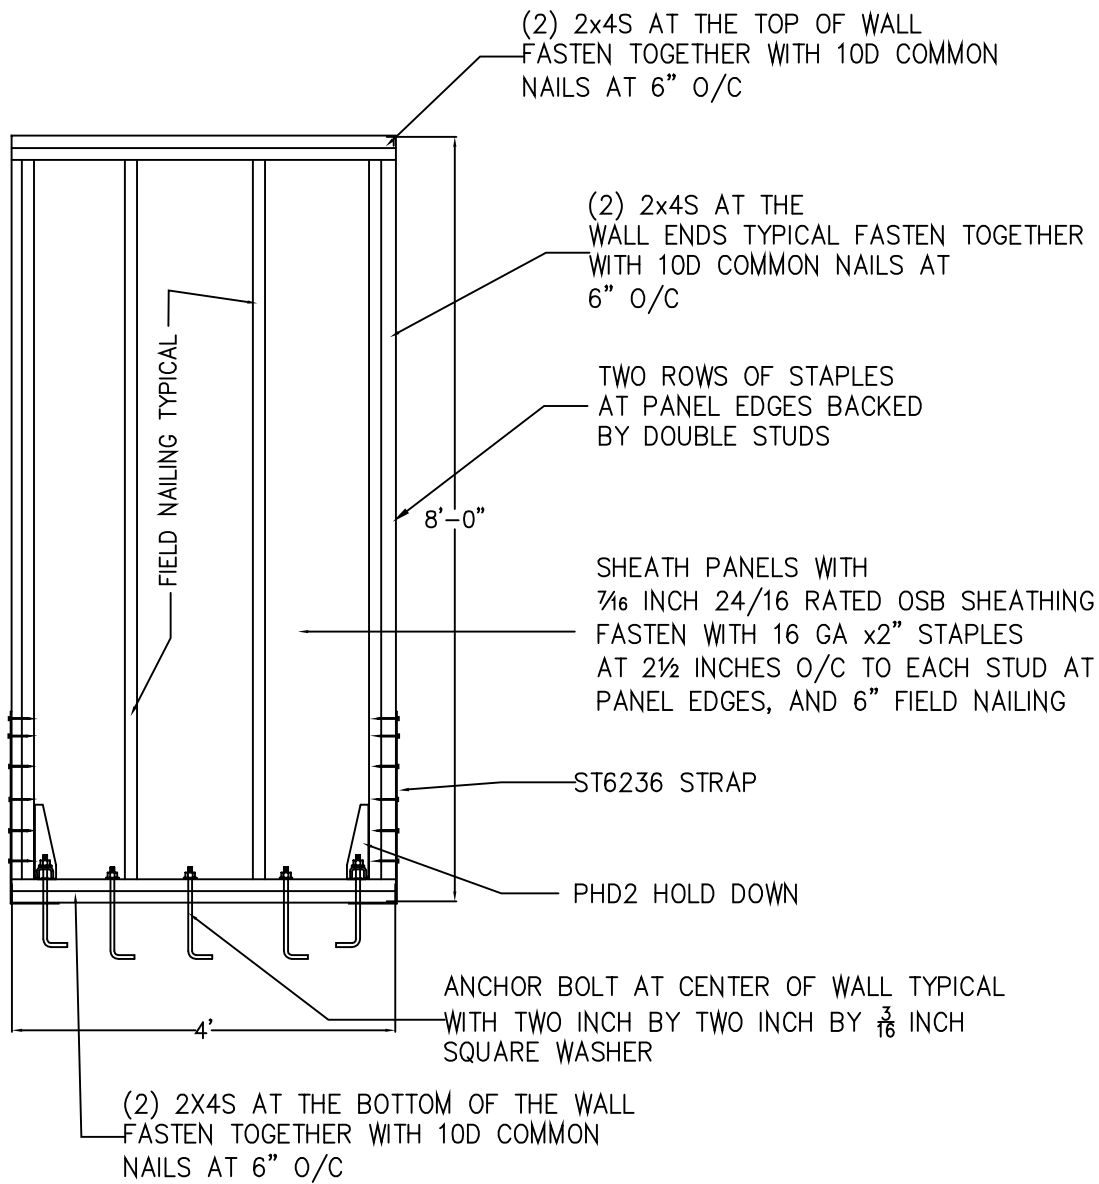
Panels 7, 8, and 9 elevation drawing.
